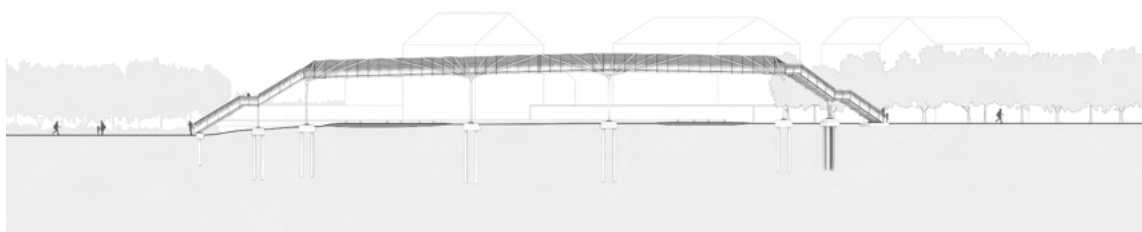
Elevation - 56m total span, 3 spans, Fan arrangement
